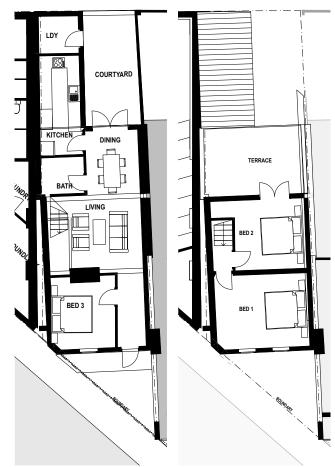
12 Nimrod Street, existing ground floor plan. Source: TZG Architects 2022. Figure 147: 12 Nimrod Street, existing level 1 plan. Source: TZG Architects 2022.
